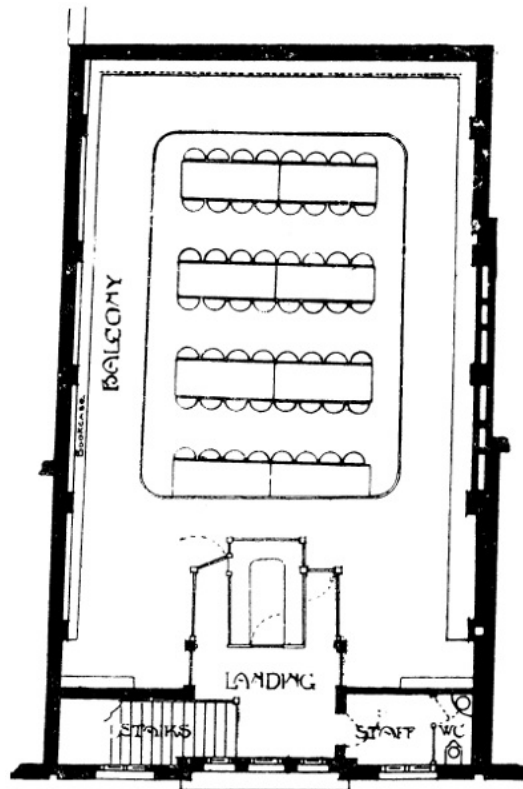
Fulham (North) Library Plan, showing Open Access Lending Library on First Floor and Reading Room, through Well, on Ground Floor ([Section 121](#)).
